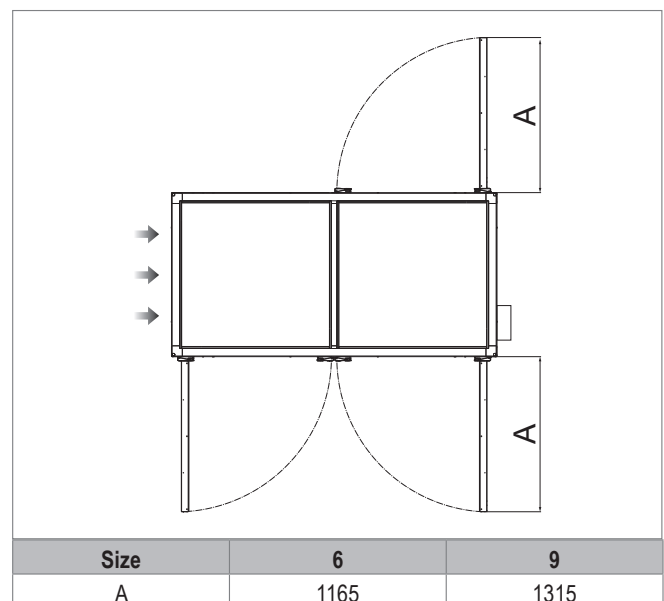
Space requirements for opening the access doors (dimensions in mm)
